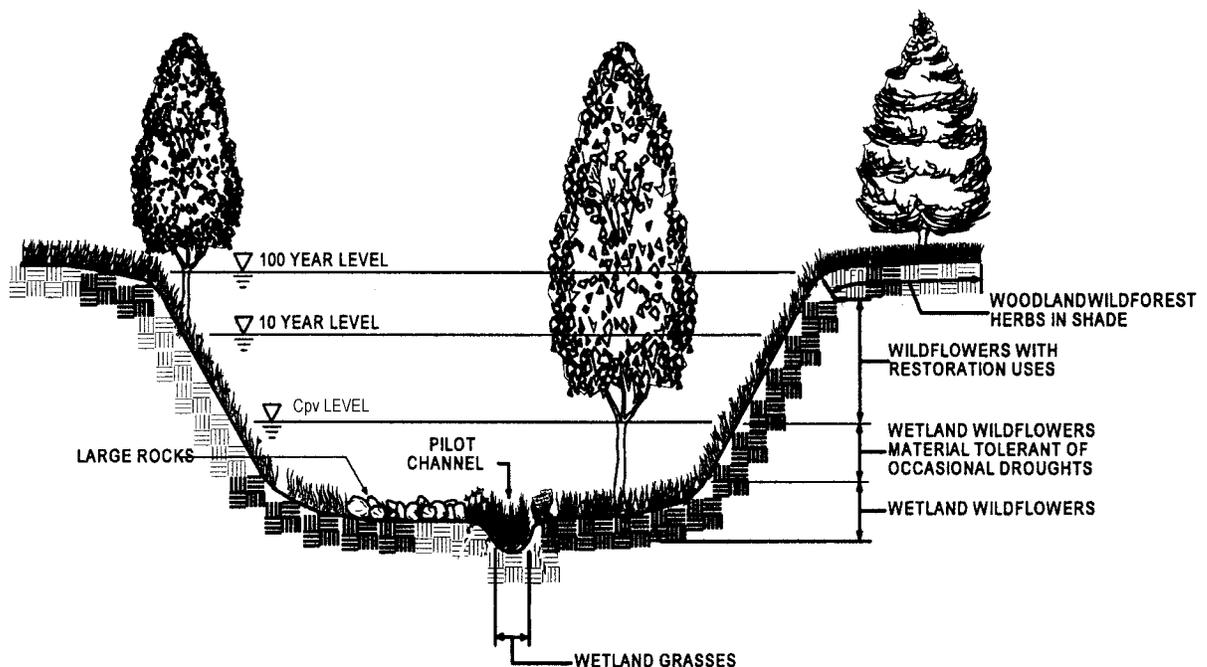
Schematic Section of Typical Stormwater Management Detention Pond
